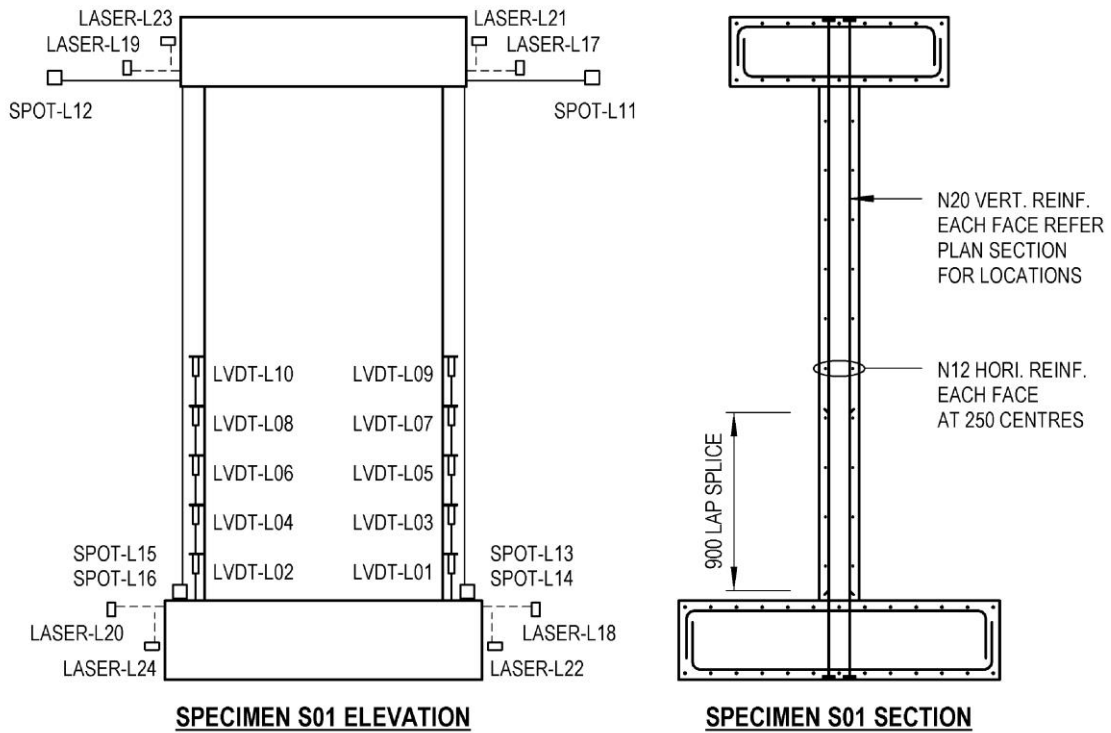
LEFT: physical instrumentation on test specimen S01. RIGHT: wall cross section of test specimen S01.
